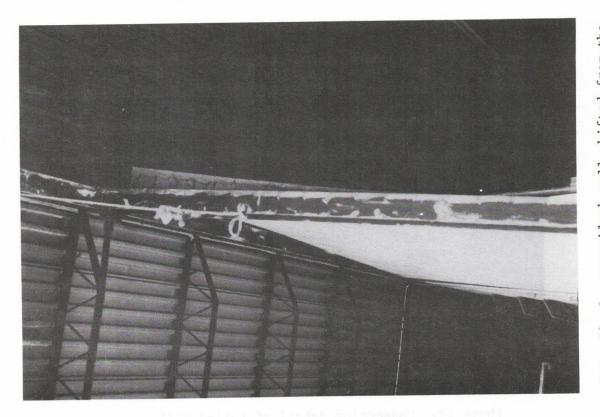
Concrete block wall shifted from the supporting steel column because of improper anchoring.
